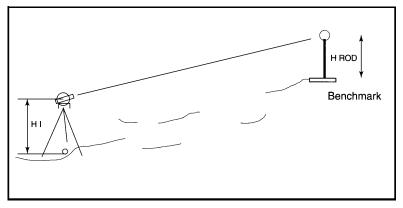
Transferring a Benchmark Elevation to the Instrument
